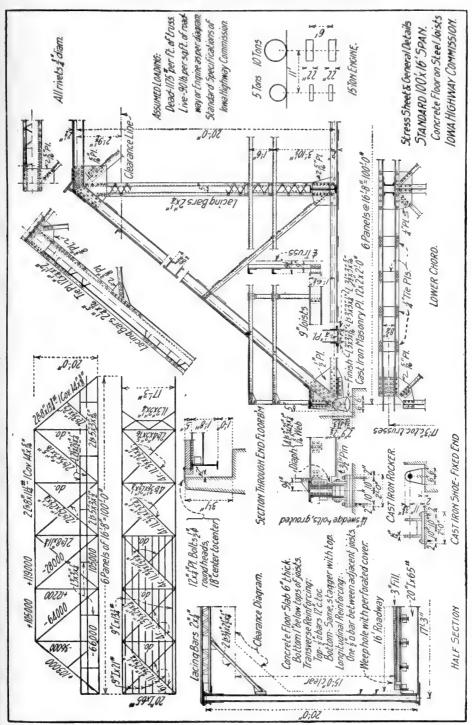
STANDARD HIGH THROUGH TRUSS SPAN.
